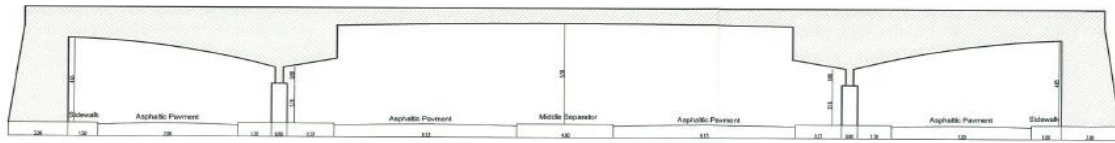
Longitudinal cross section of the bridge (section 5-5)
